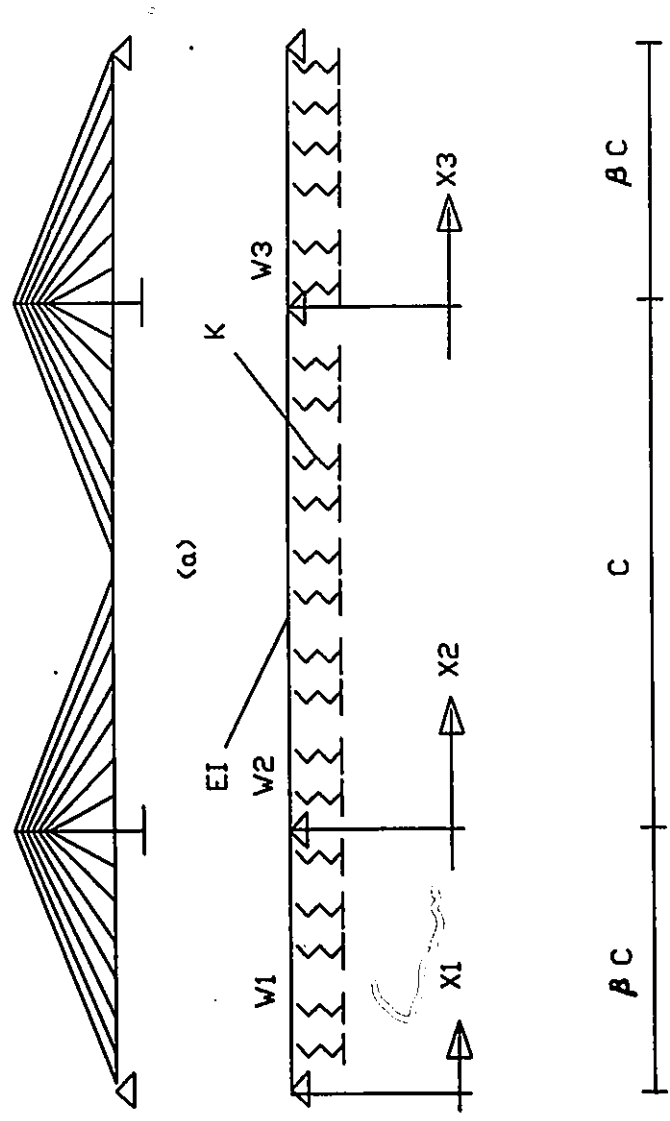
a) General Lay out of a Typical Cable-Stayed Bridge with Three Spans and Multi-Cable Arrangement
